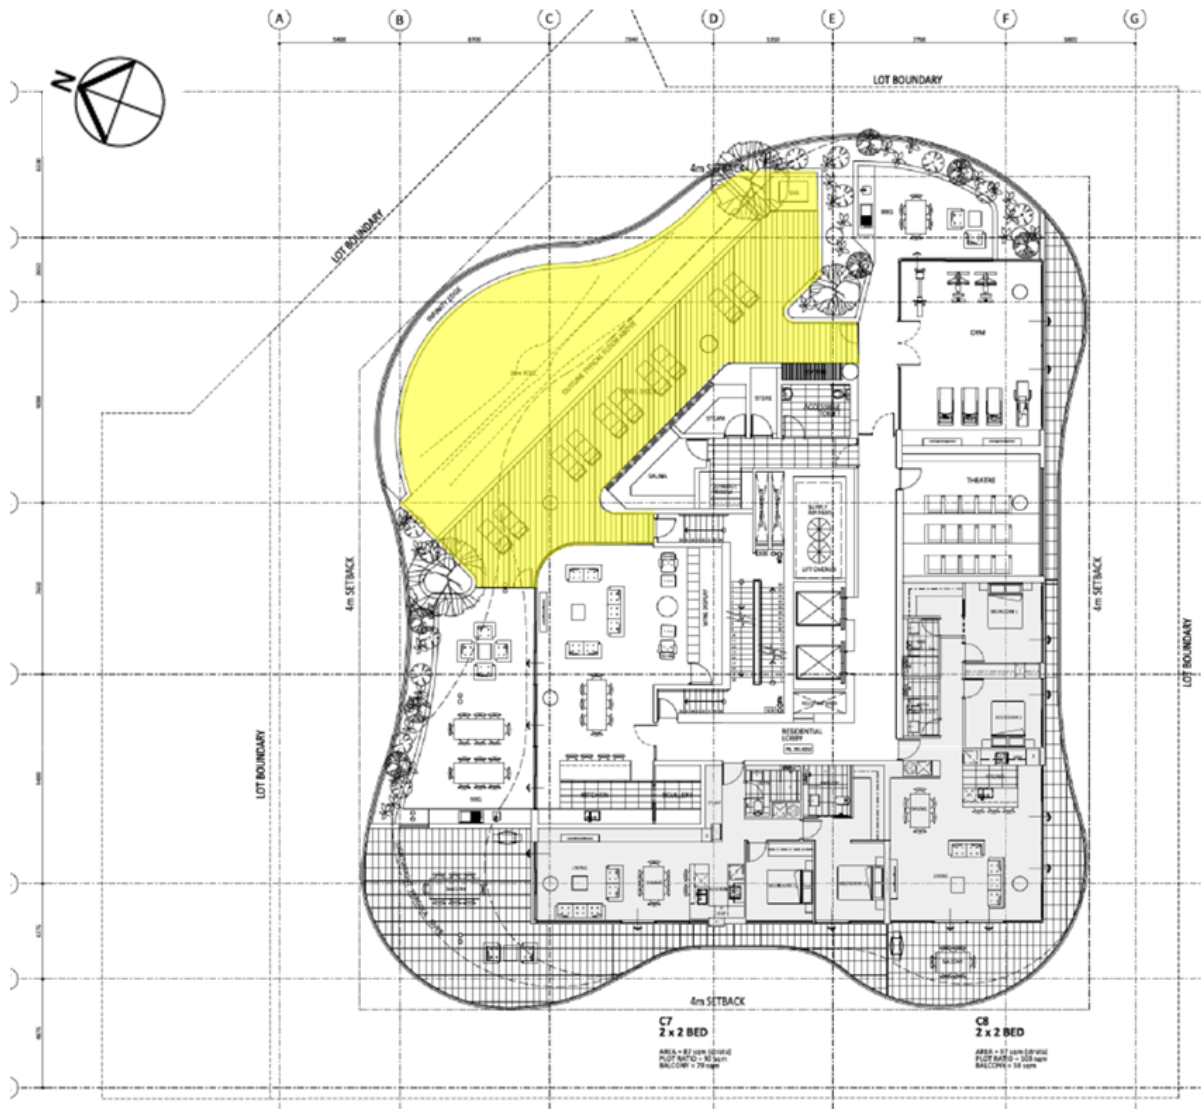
Plan view of the ground floor of the proposed development with the recommended wind criteria overlaid.
